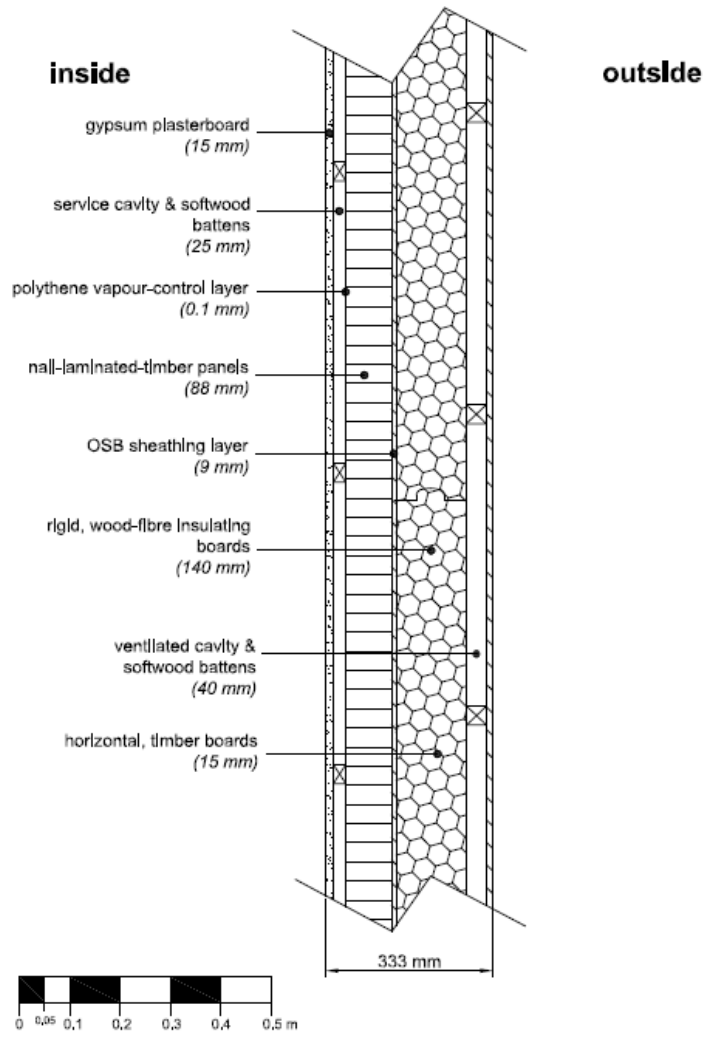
Wall E2 (nail-laminated timber (NLT), external solution: timber cladding), horizontal section.
